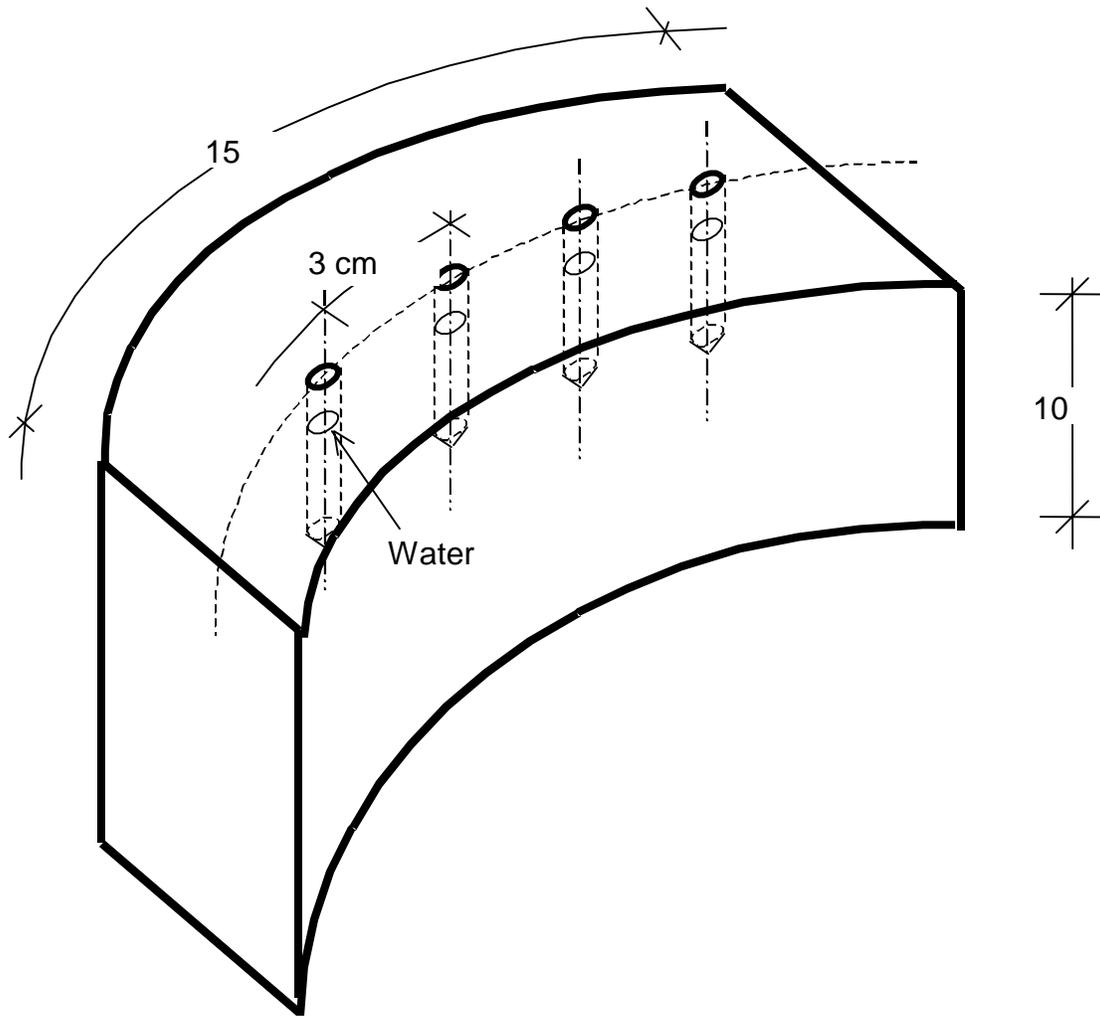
Concrete Culvert Segment for Pore Water pH Measurements.
